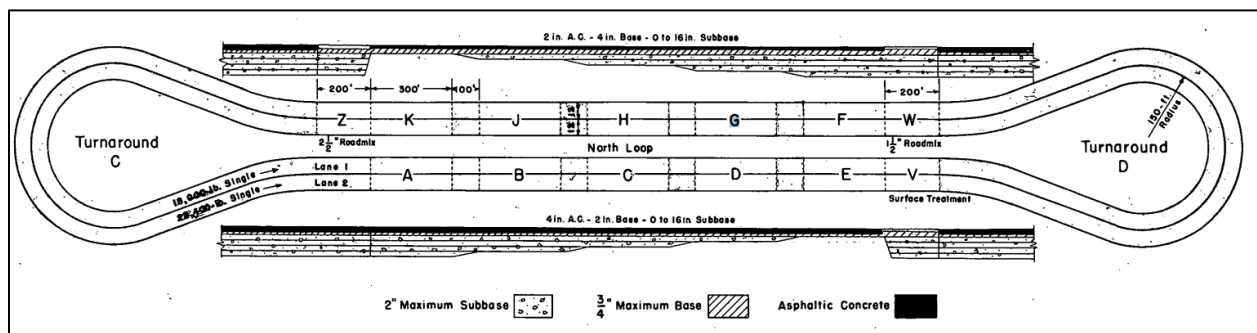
Schematic Layout of Test Loops at the WASHO Road Test (NRC, 1955).
